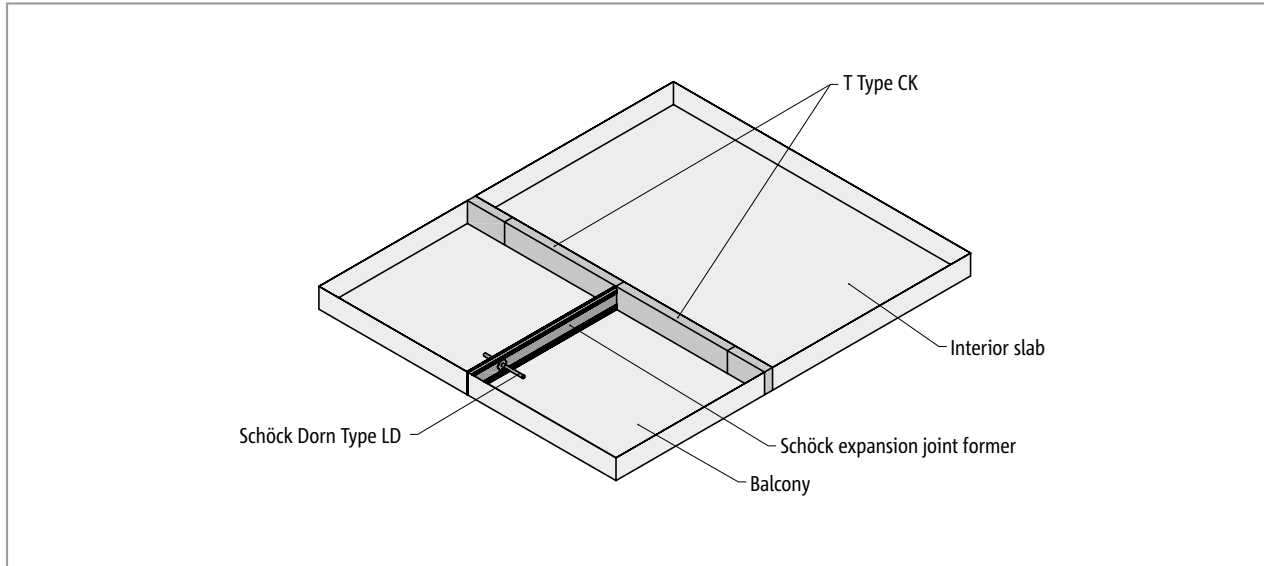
Schöck Isokorb® Type CK: The expansion joint former
